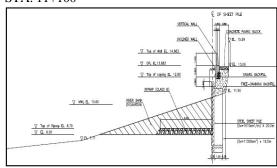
Typical Sections of Harbor Revetment Designed in the Preparatory Study
